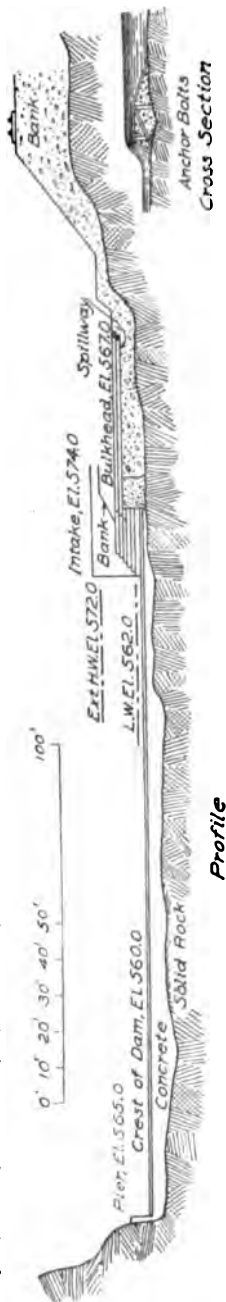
Section Showing Submerged Dam of the Water-Power Plant of the Snoqualmie Falls Power Company, Washington.
